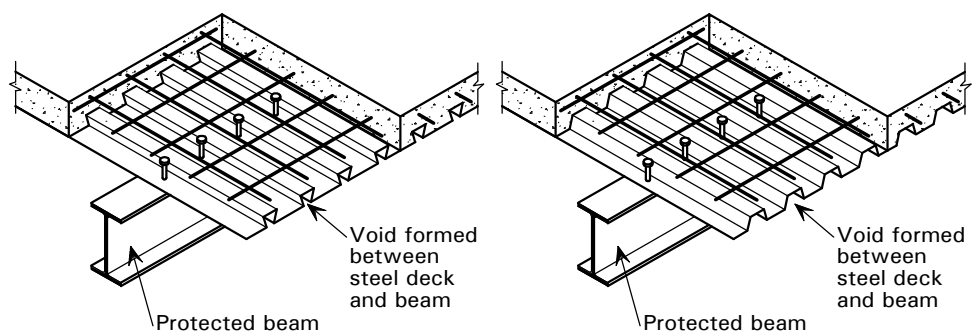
Composite beams; dovetail decking and open trapezoidal
